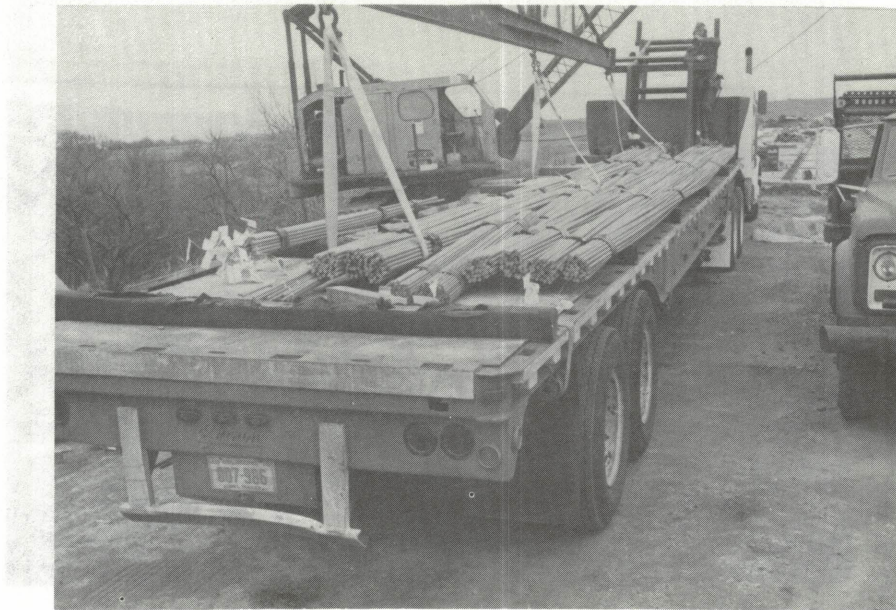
Epoxy coated rebar were shipped from a Tulsa firm on a flat bed semi-trailer truck. To avoid damaging the epoxy coating, the rebar were placed on carpet covered studs and held by nylon attached to the truck.
